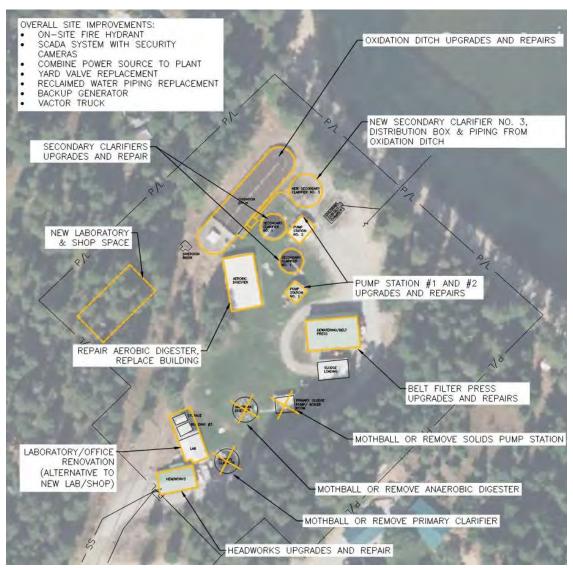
Alternative B to Repair and Upgrade Existing Facility
